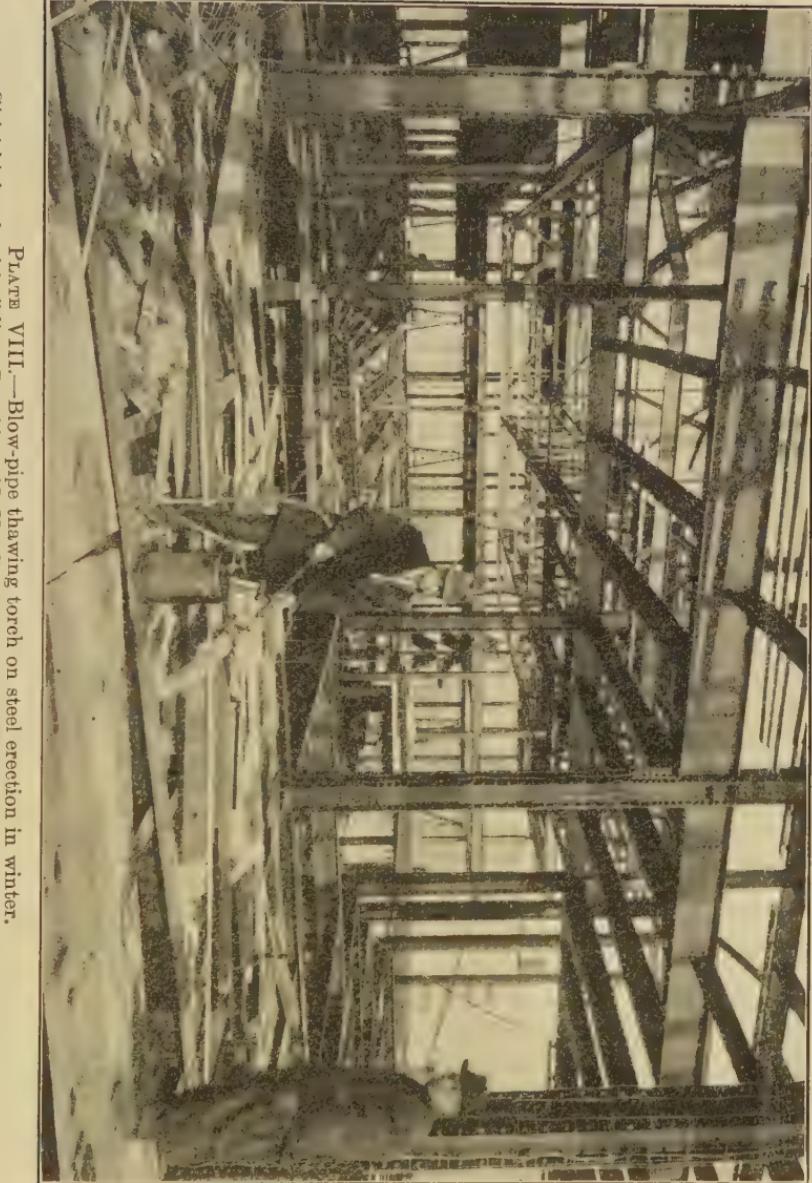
PLATE VIII.—Blow-pipe thawing torch on steel erection in winter.
